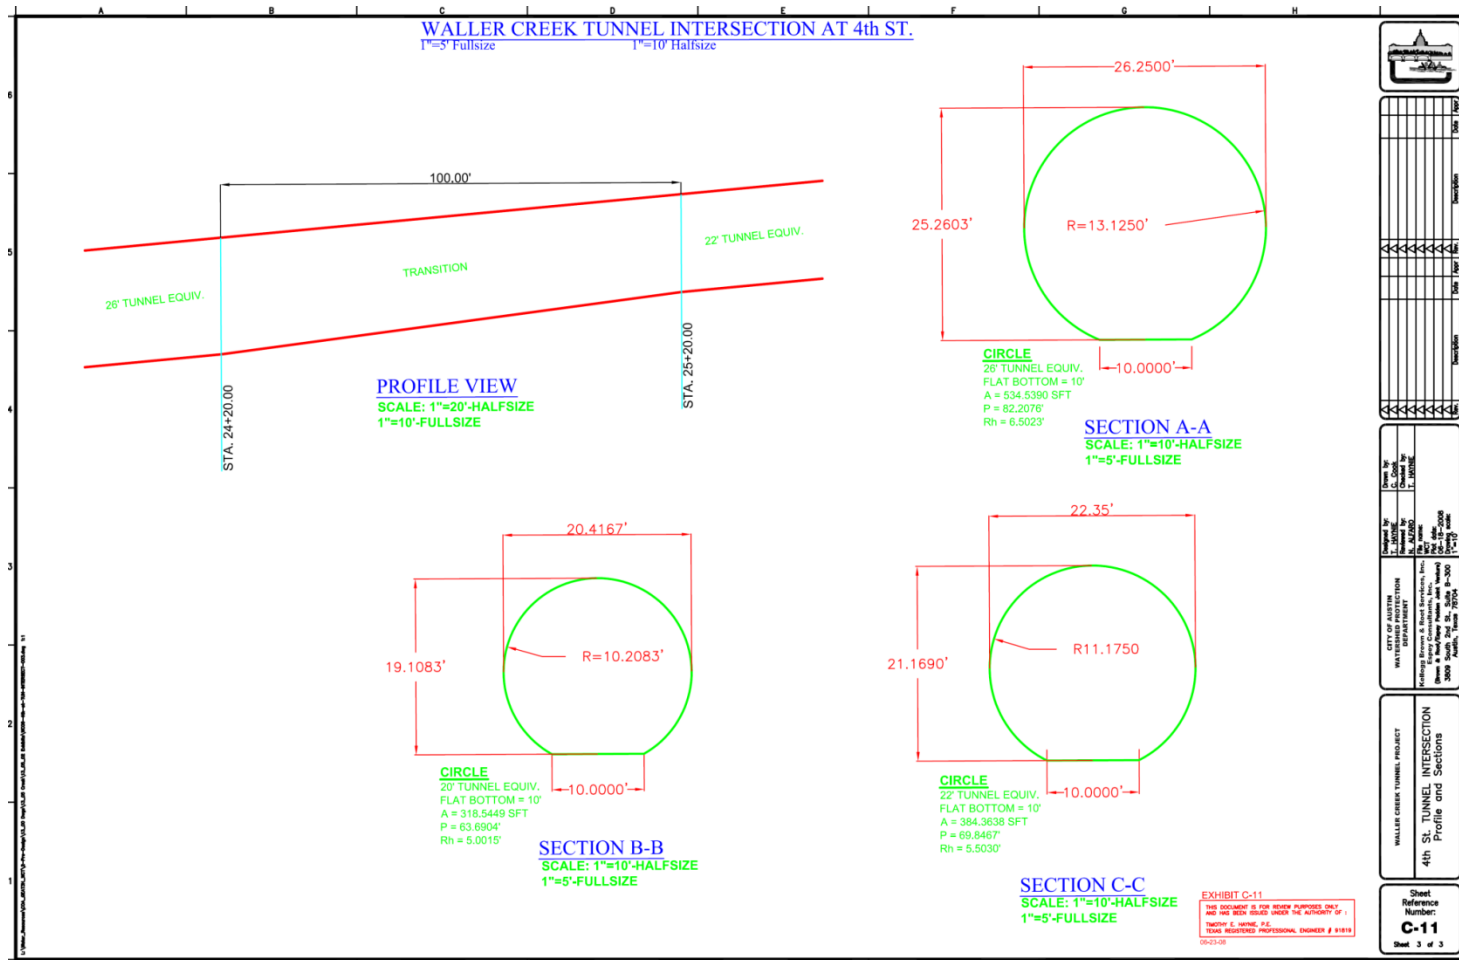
Waller Creek Tunnel Project; Tunnel Intersection at 4th Street–Profile and Sections
